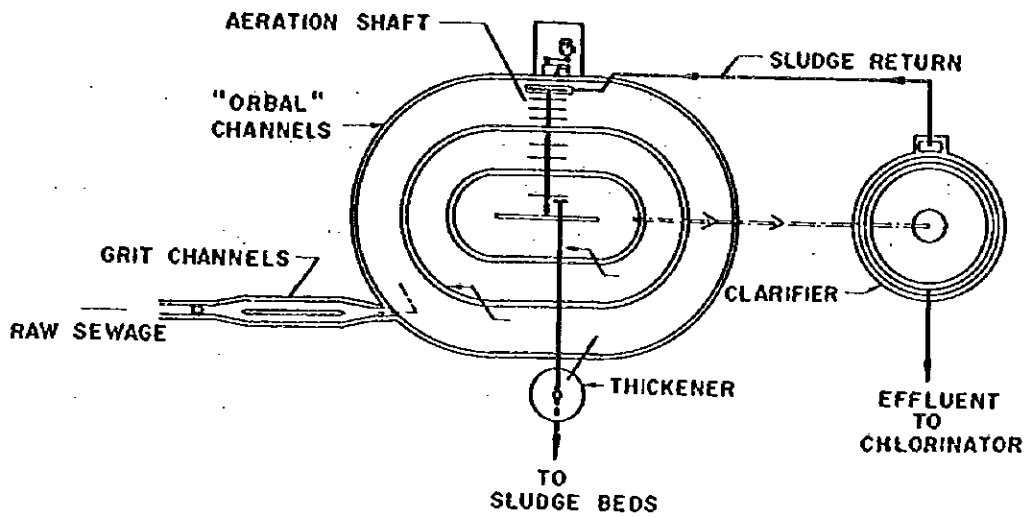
8 PLAN OF SEWAGE TREATMENT PLANT
